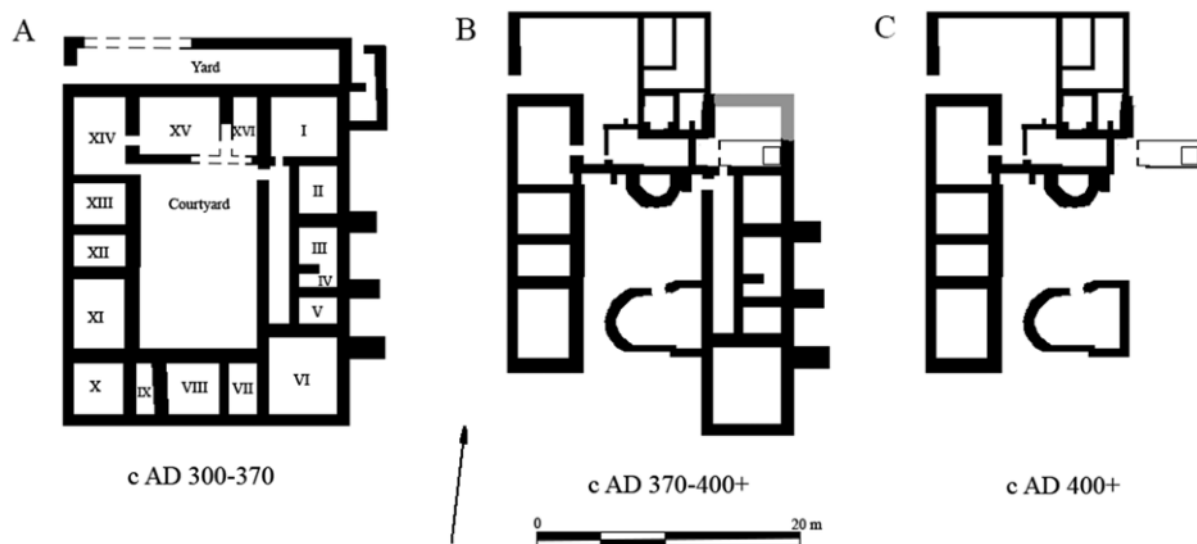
The plan of the *praetorium* at *Vindolanda*: A. the structure c. 300-370; B. the structure c. 370-400 and possibly later; C. the excavators' preferred plan c. 370 and later. © Rob Collins.
